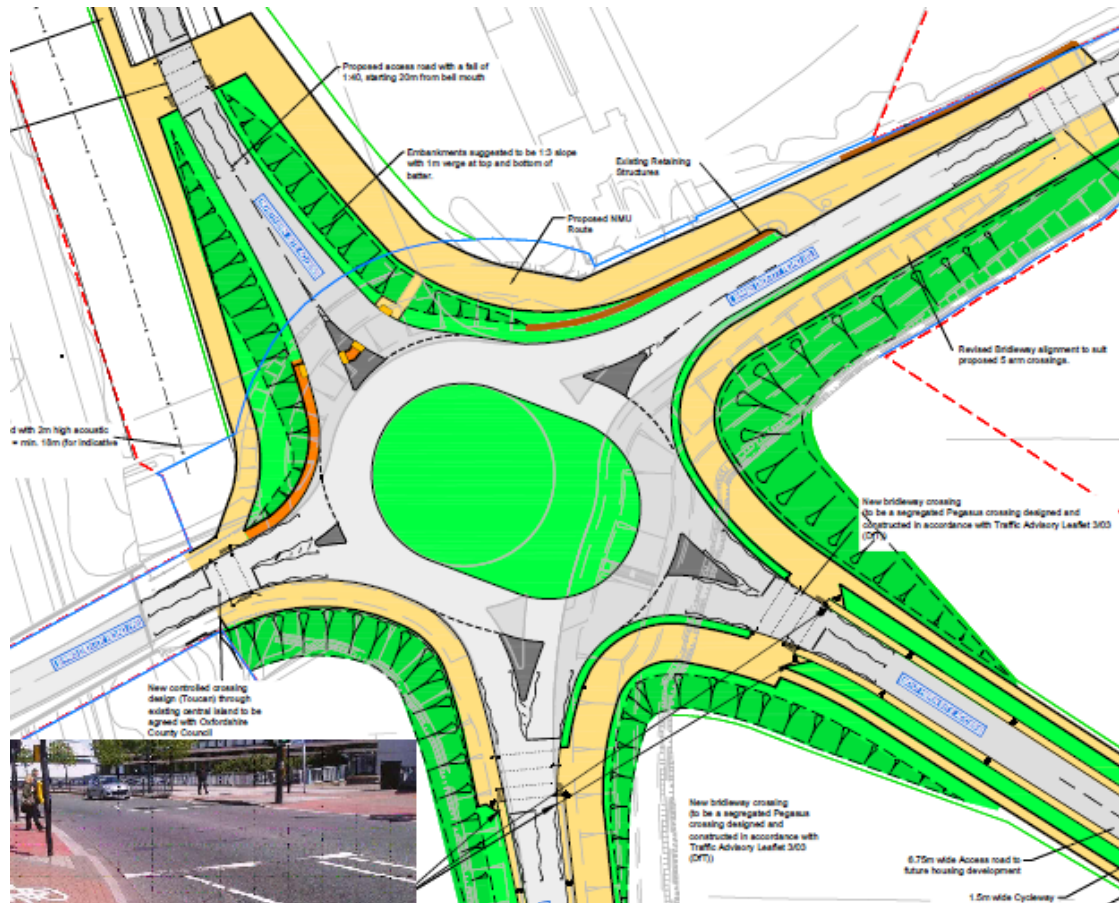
Proposed 5 arm roundabout layout (extract Brookbanks drawing ref 10219-HL-61-100-004 E)
